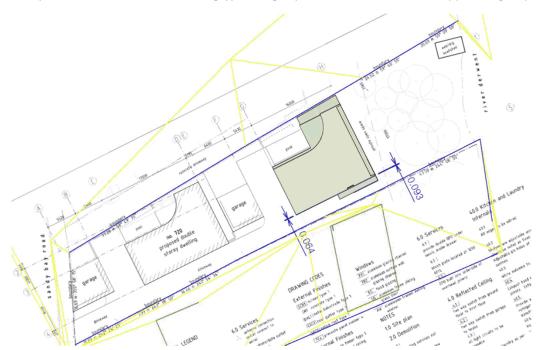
Cadastral survey plans / site plan and model location. Dimensions are estimated differences between plans & as constructed laser scan.
